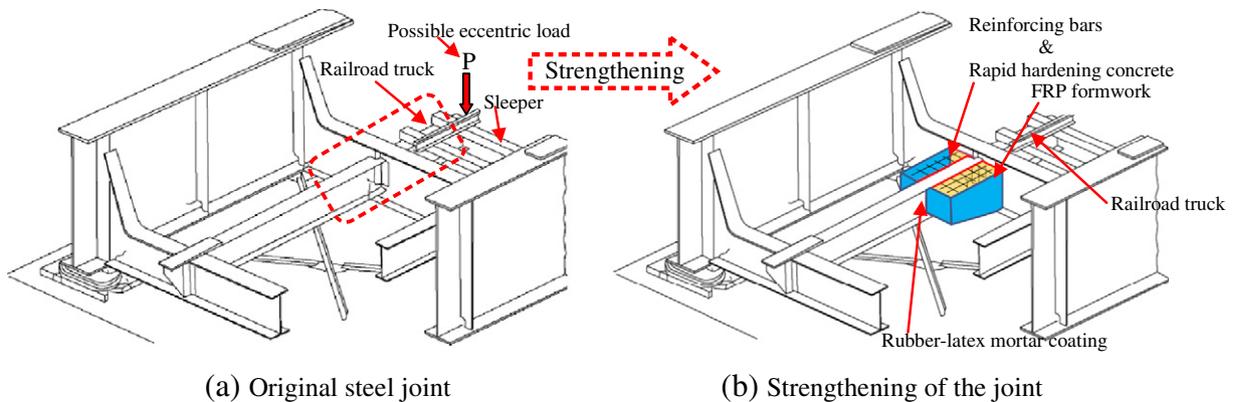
Images of strengthening of longitudinal and transverse beam connection joint in steel railway bridges.
